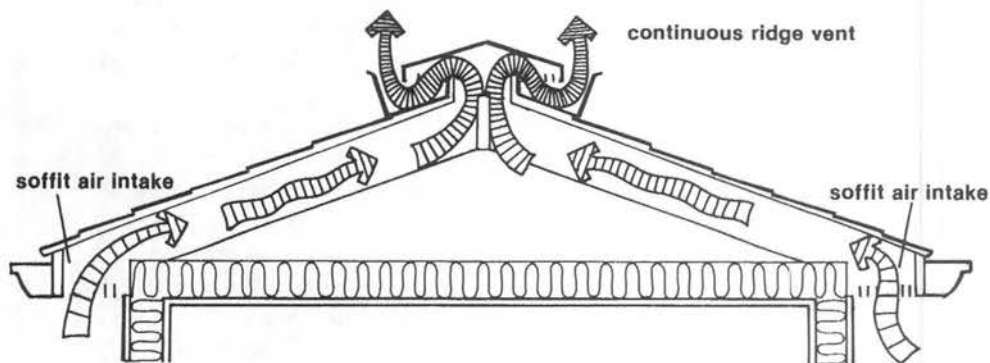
Continuous ridge ventilation with soffit air intake is the best roof venting system available. As the roof heats up, a convective flow is initiated whereby heated air exhausts through the ridge vent, and cooler air enters through soffit vents.
